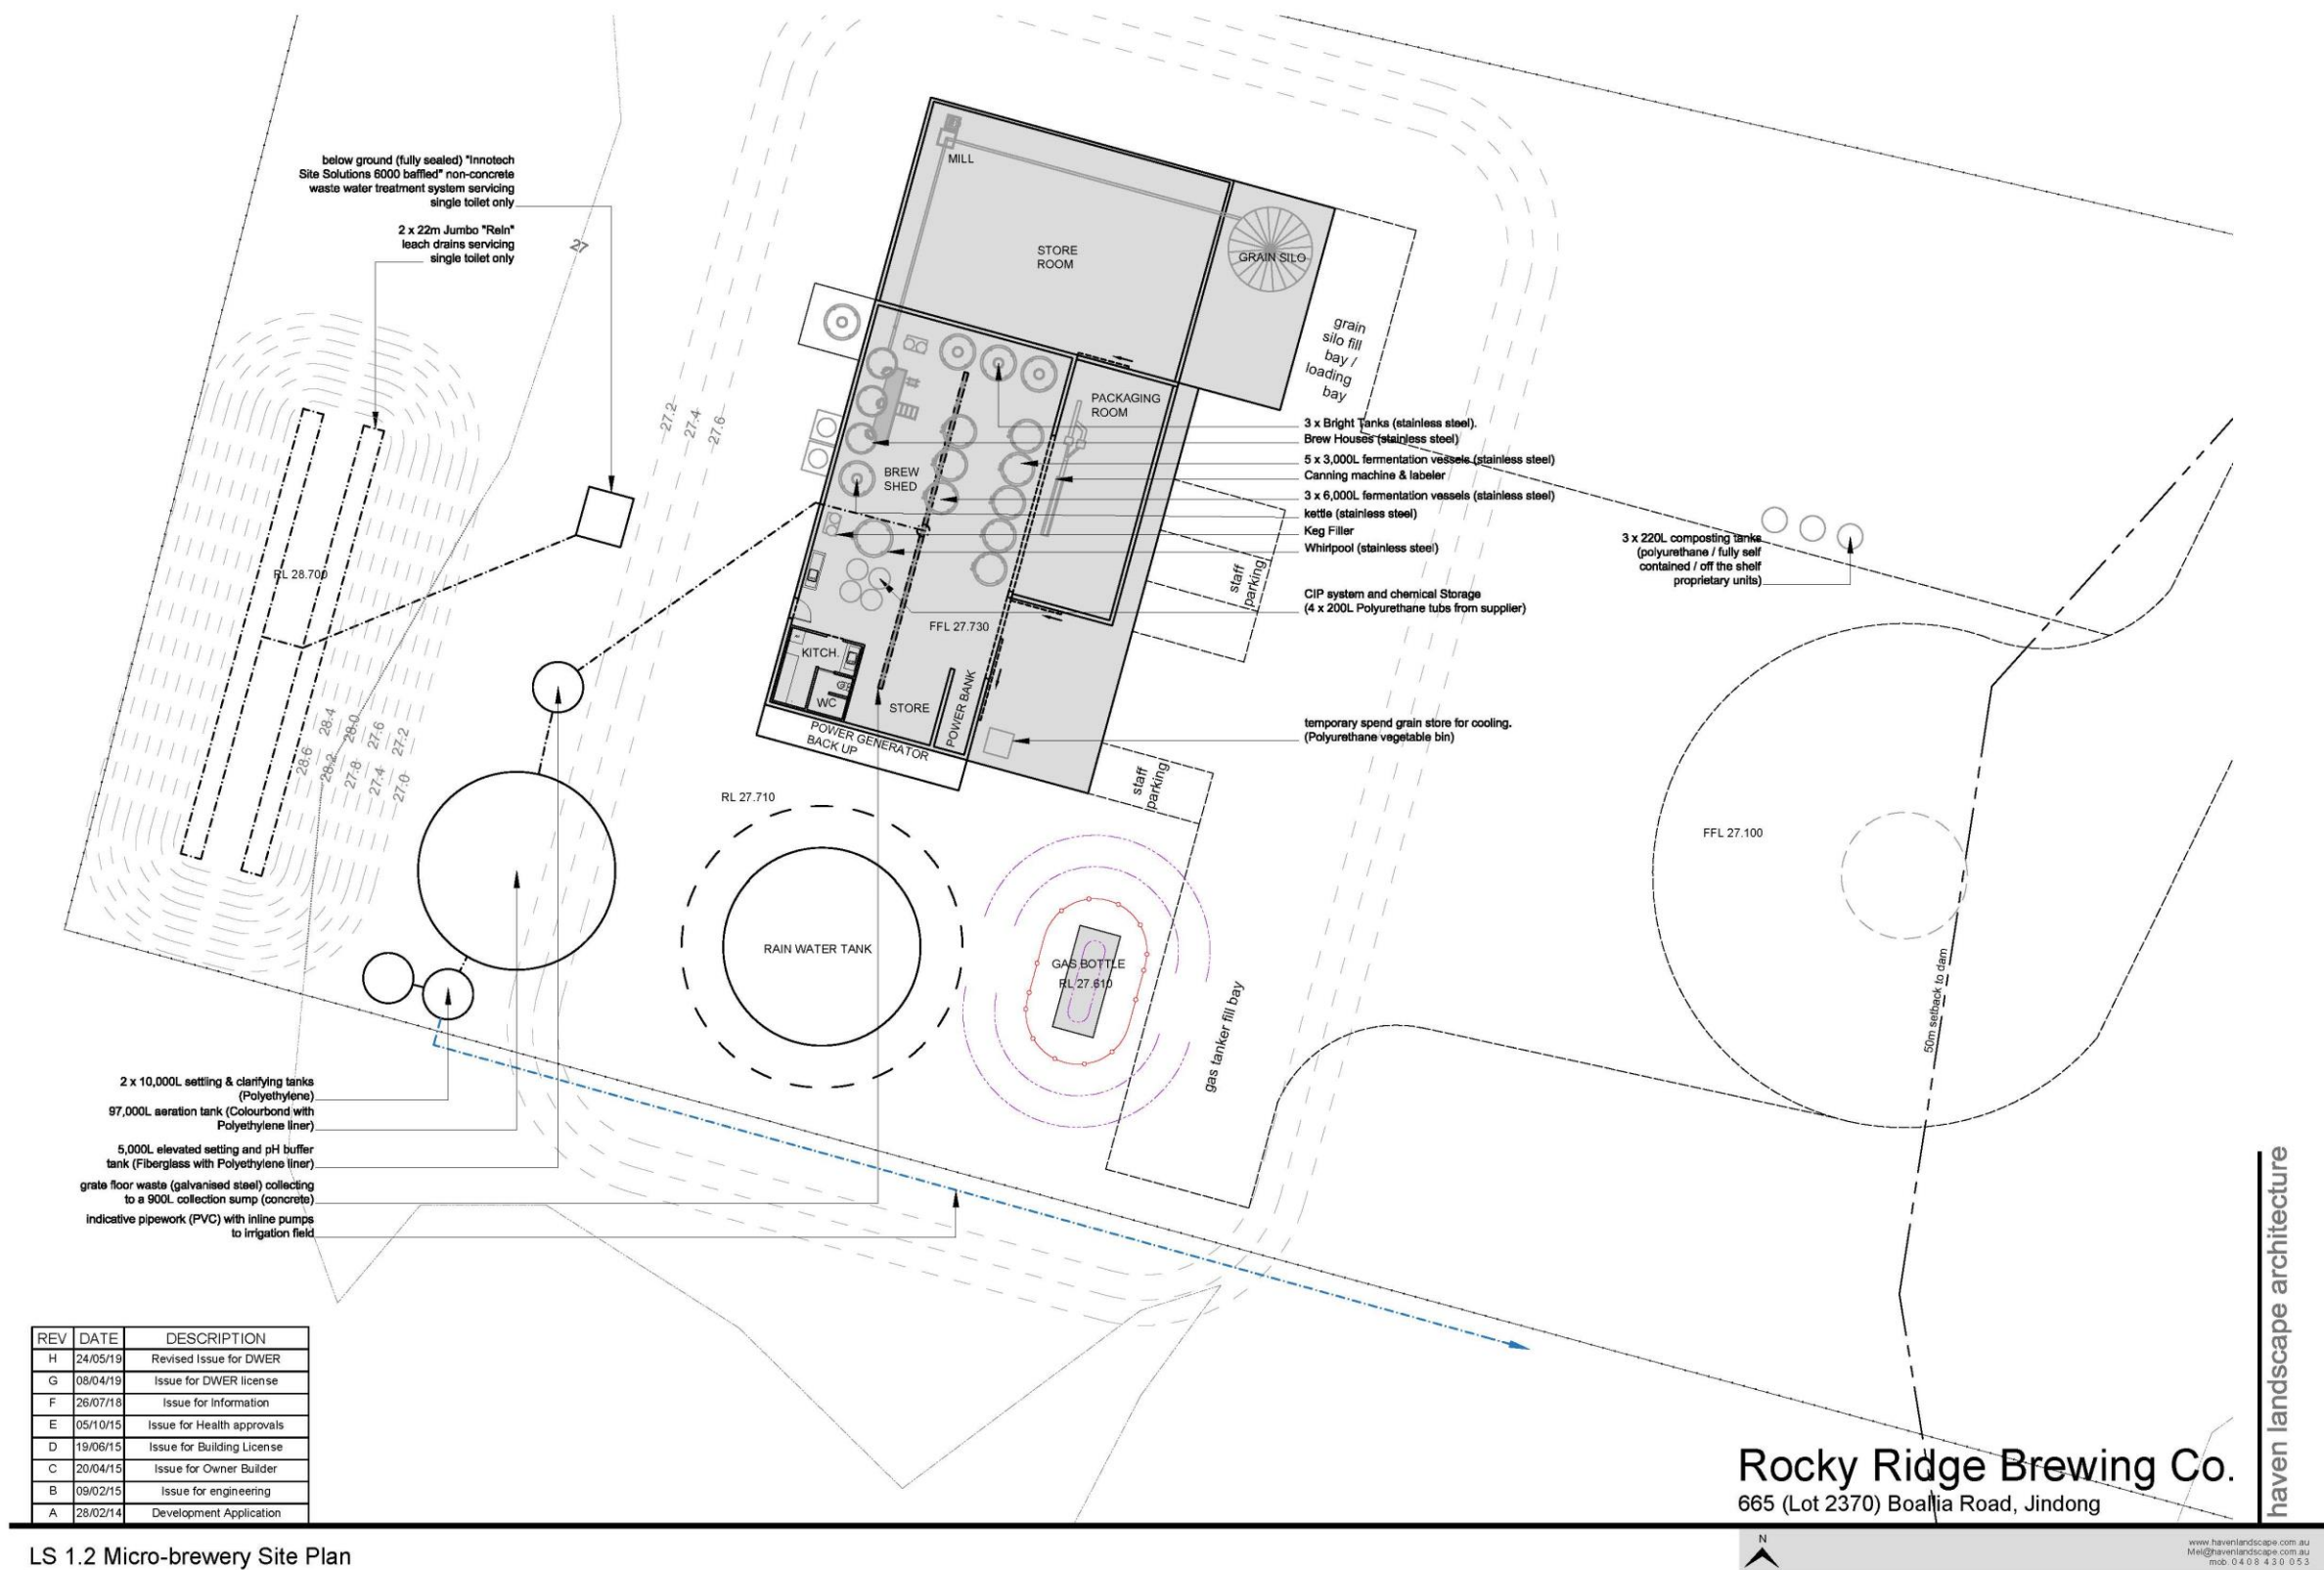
Site Plan of Rocky Ridge Brewery and WWTP.
